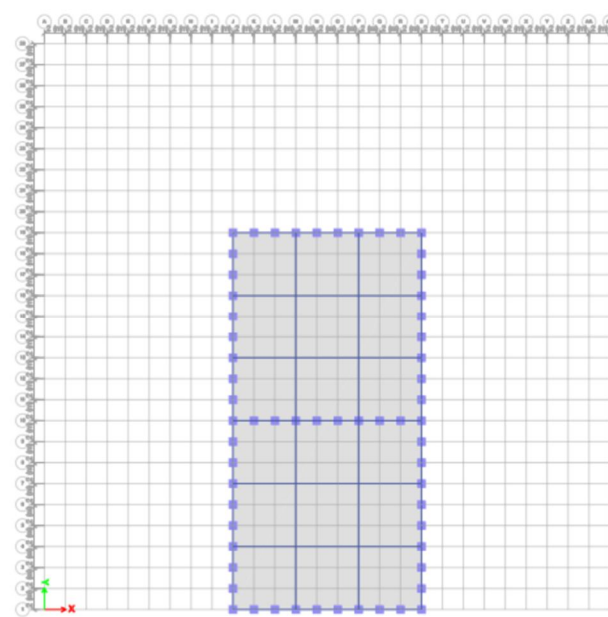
Plan of 31th to 40th storey of Bundled tube structure
